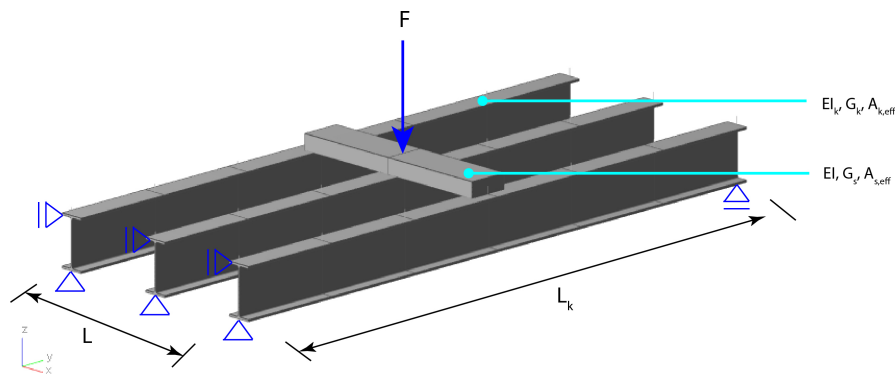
Sketch of three longitudinal girders with one deck beam loaded by a concentrated force 'F'
